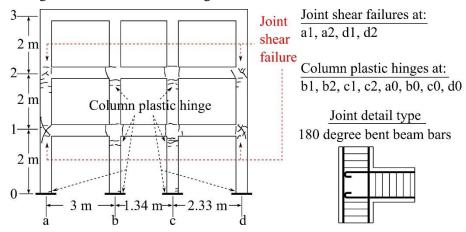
The damage summary of the test specimen (Redrawn from the source: Pampanin et al. 2004 and Pampanin et. al. 2007)
